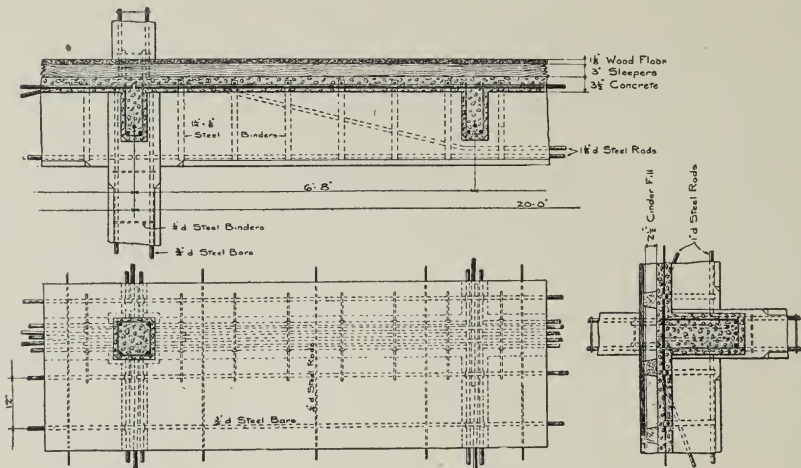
Type Used by the American Concrete Steel Company, Newark, N. J.
